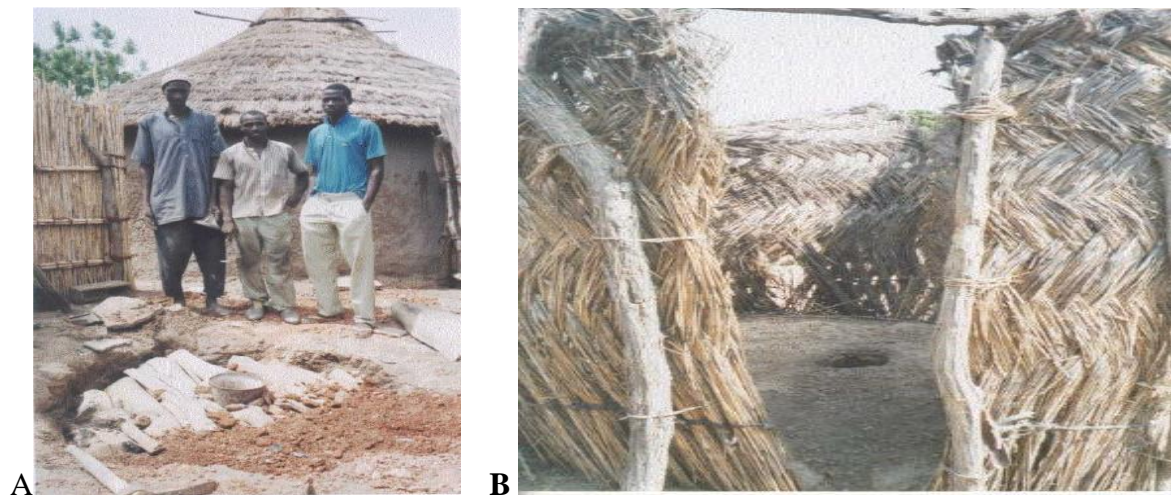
(A) Wood Slab of Traditional Latrine Floor
